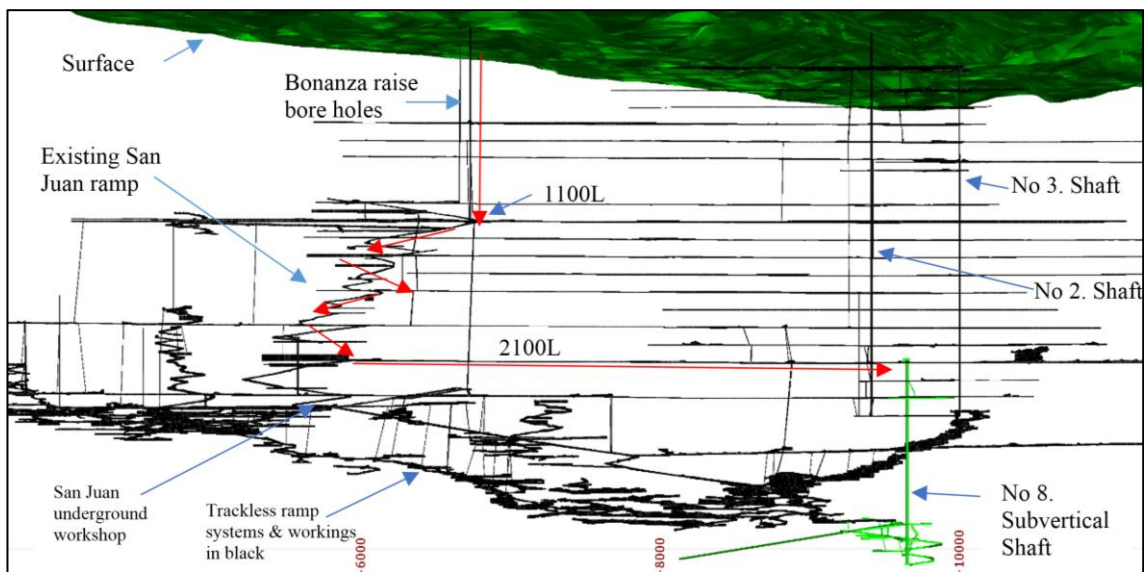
Long section of the El Mochito mine, looking north, showing the Bonanza route to be used for lowering large equipment (hoist, raise bore parts, etc.) from surface to the new No. 8 shaft
